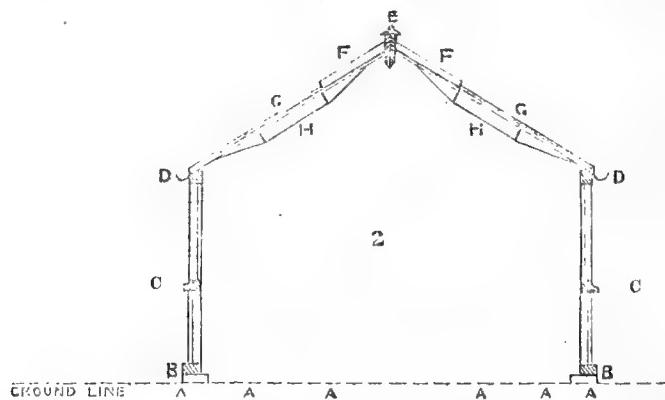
SECTION OF PORTABLE GREENHOUSE, WITHOUT RAFTERS, ON THE TRUSS PRINCIPLE.
